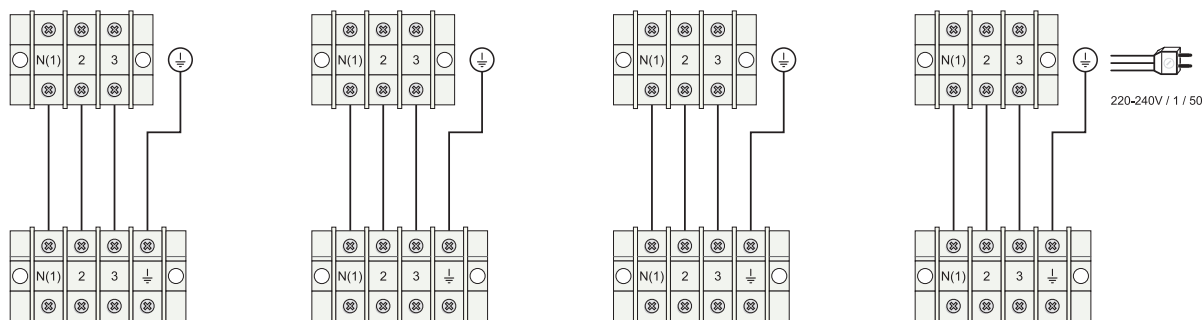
Electrical layout for outdoor and indoor connection.
